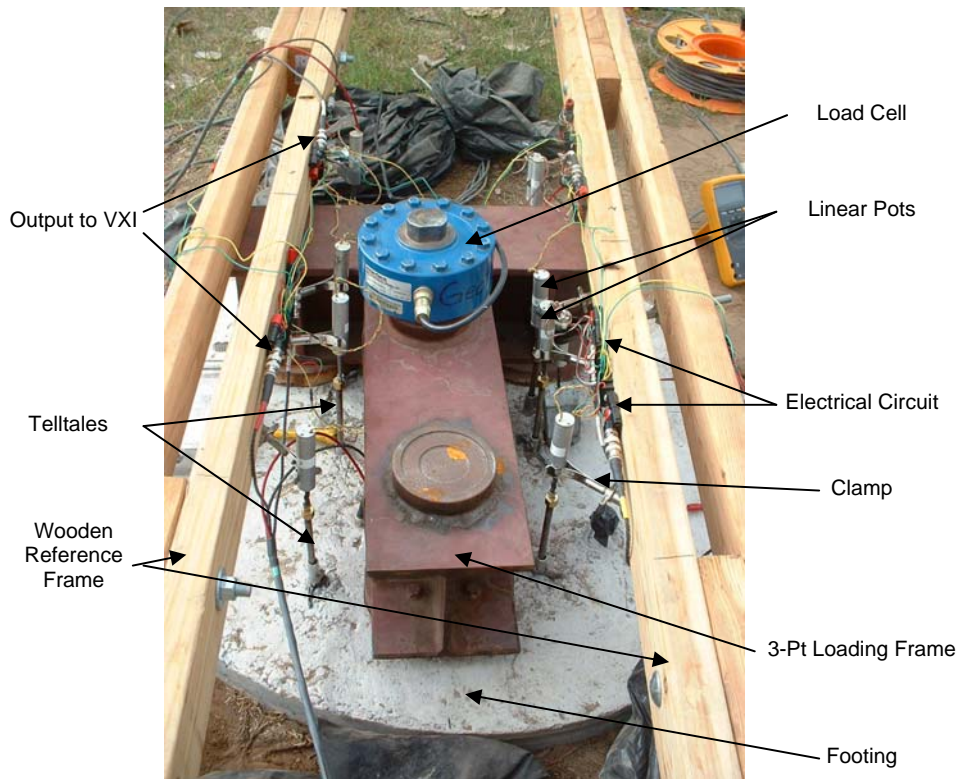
Plan View of Reference Frame over Footing and 3-Point Loading Frame
